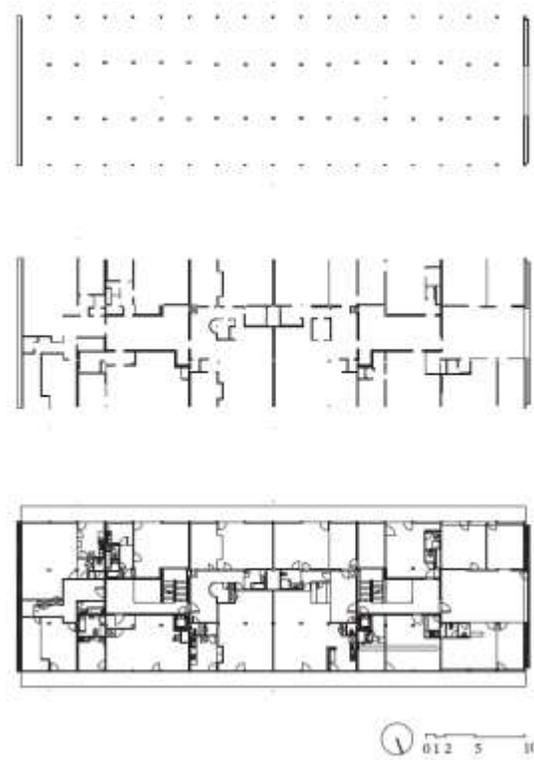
structural elements, floorplan, source: J.-L. de Chambrier
